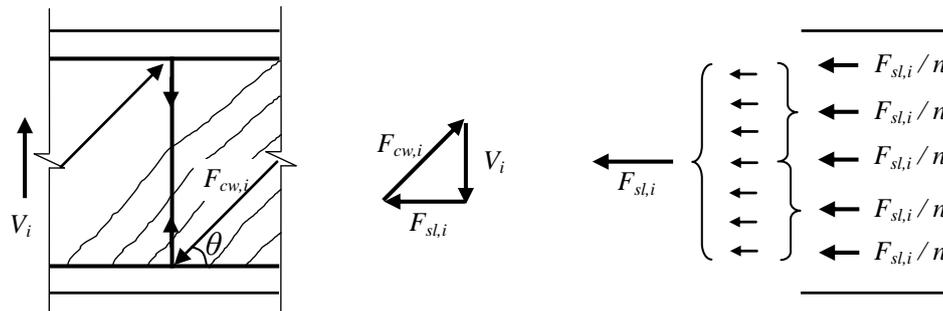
The compressive force $F_{cw,i}$, representing the inclined compressive stress field between cracks, will cause a resulting tensile force, $F_{sl,i}$, that is distributed on n reinforcing bars along wall i of the cross-section.
